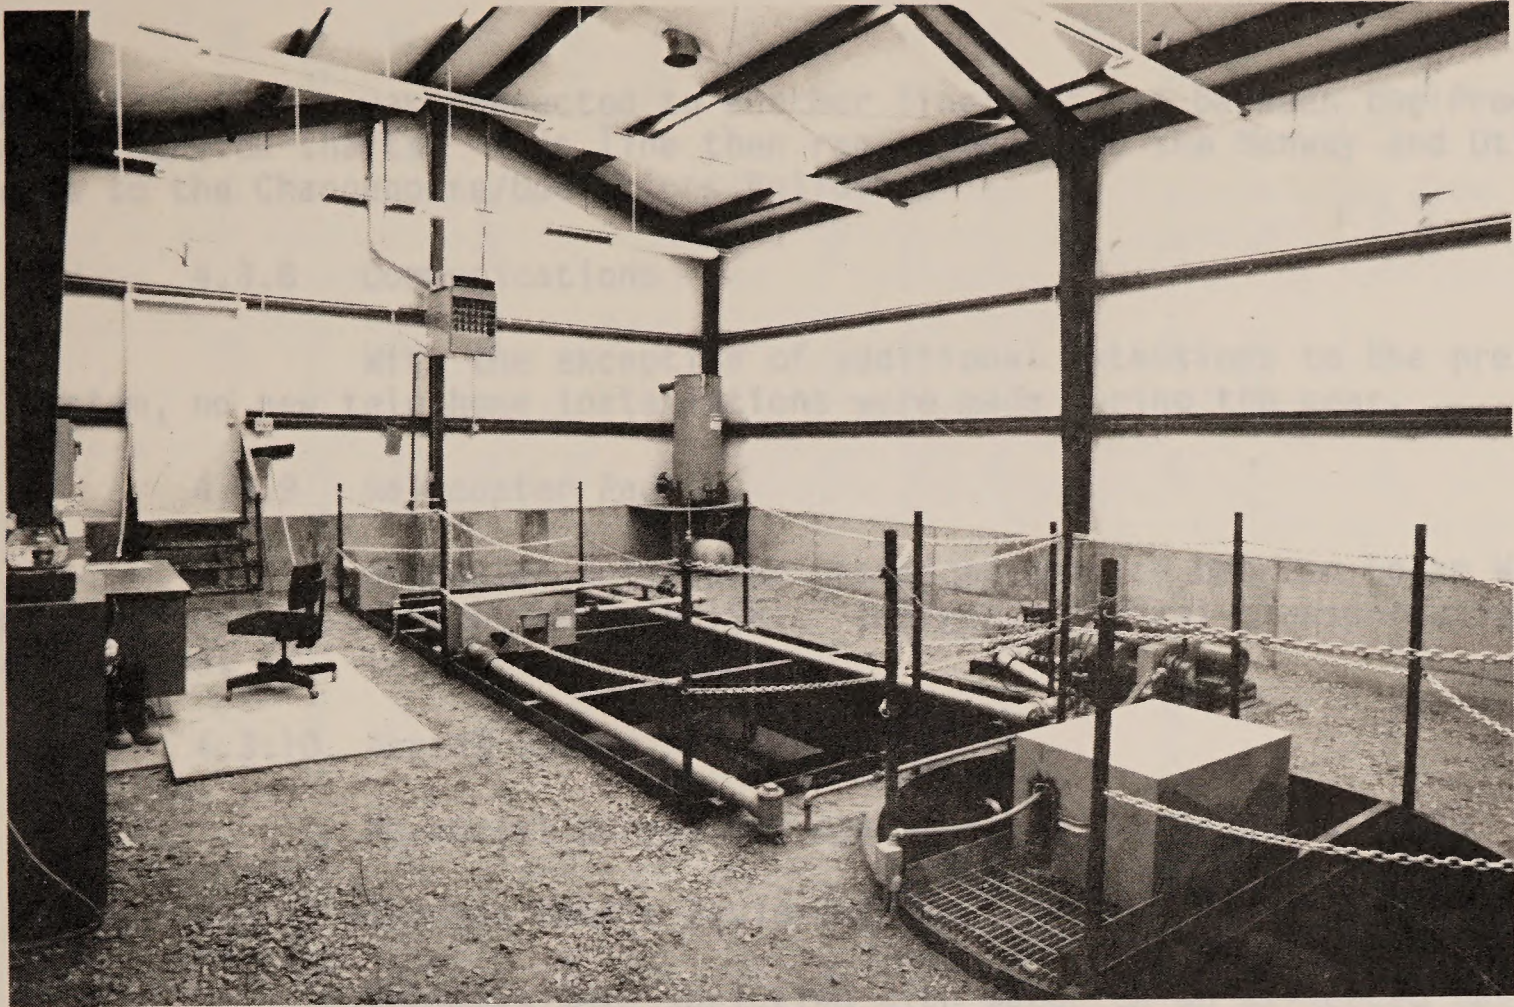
Interior of the completed 9,000 gal/day sewage treatment plant. (March 1981)
